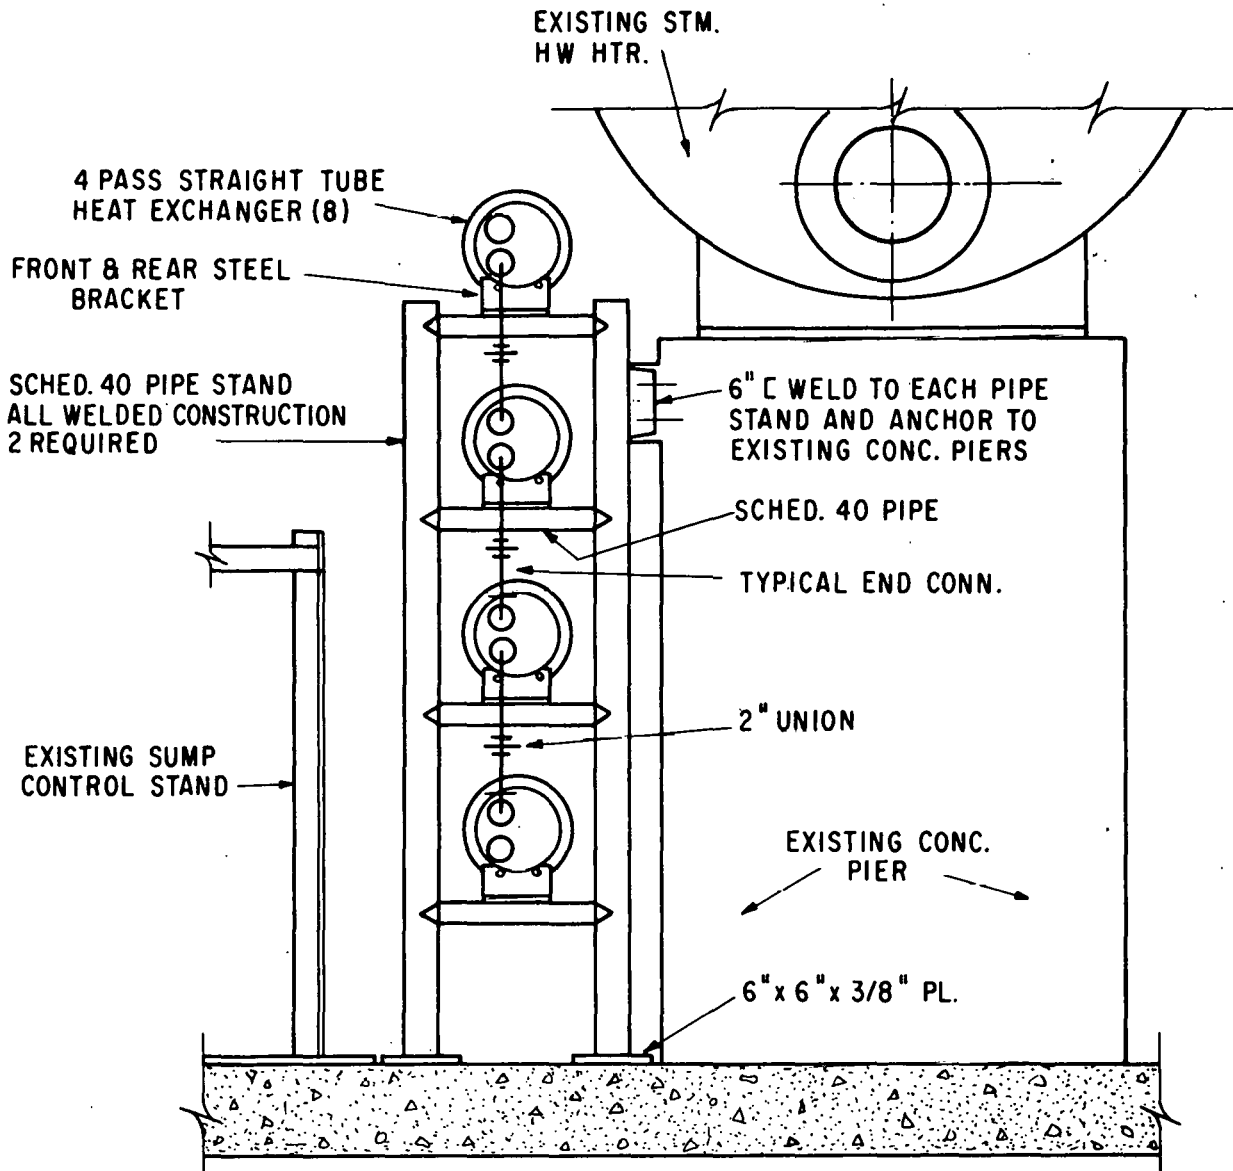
Mounting Detail for Multiple Shell-and-Tube Heat Exchangers in a Large System
